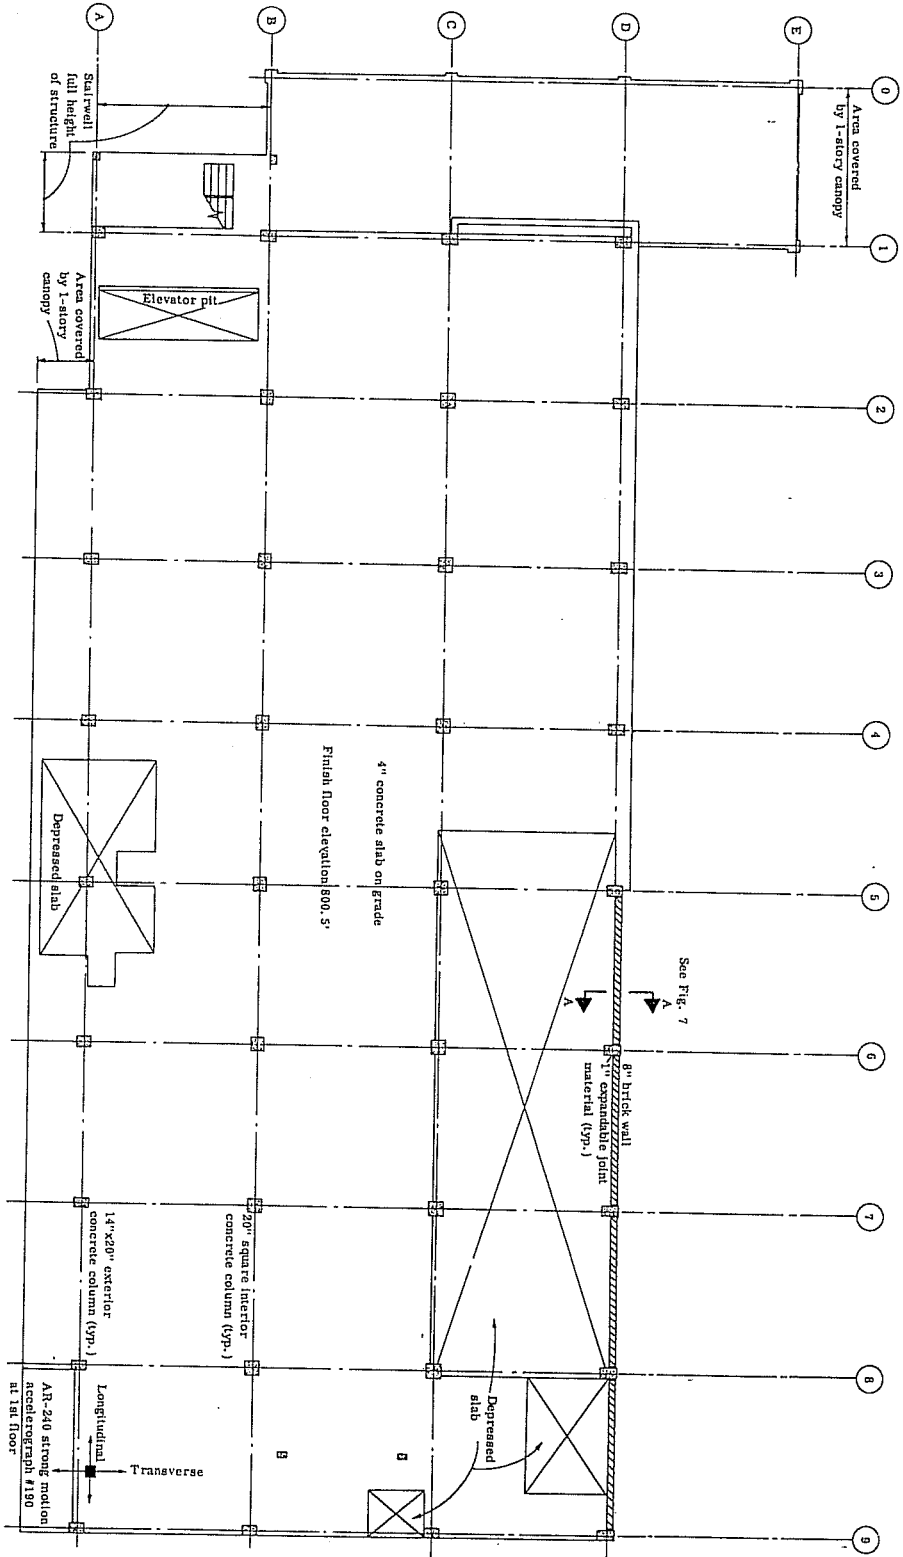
Seven-Story Hotel. First-Floor Plan⁶⁸
